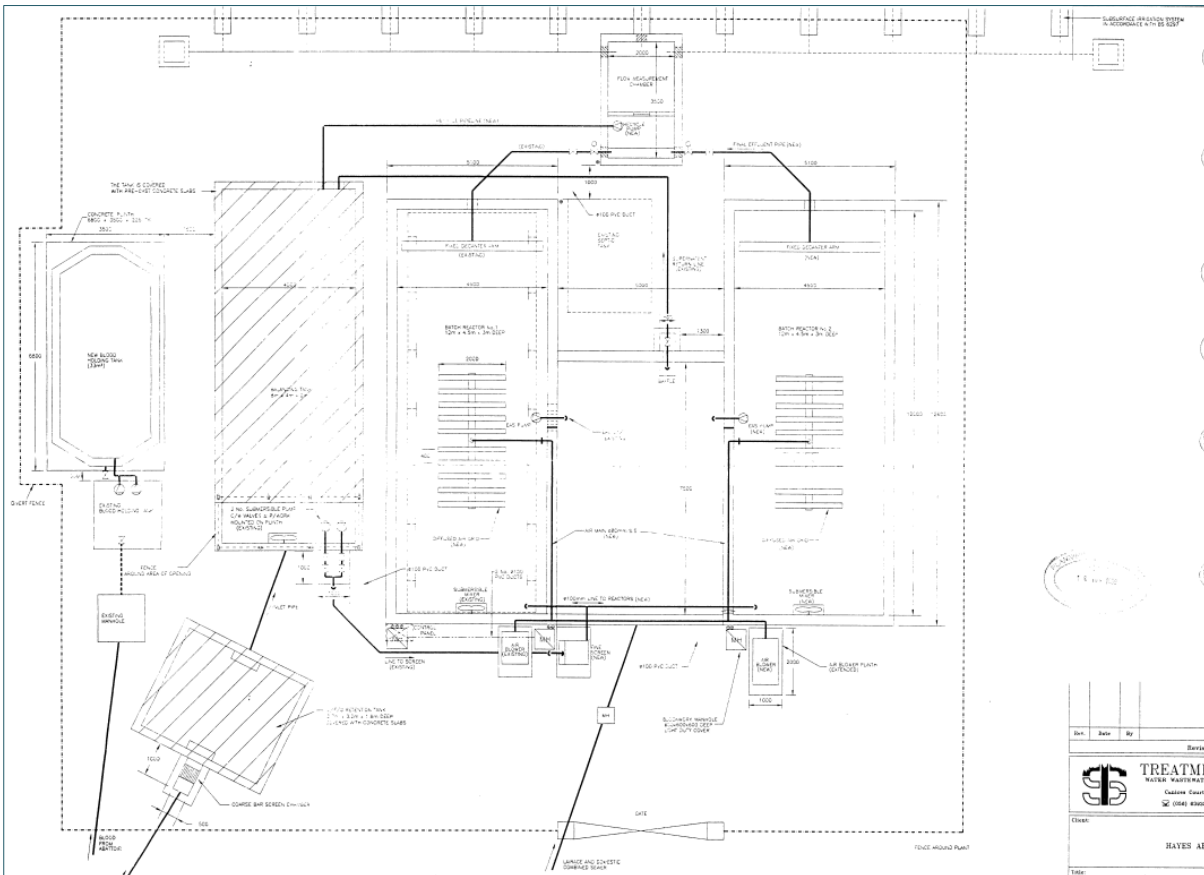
Extract from Site Layout Plan, Reg. Ref.: 99/2499 [Source: Extract from Site Layout Plan, Reg. Ref.: 99/2499]
